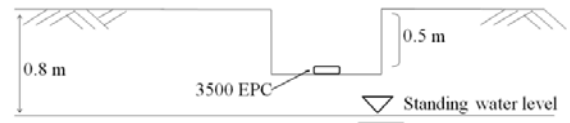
Cross-sectional view of trench and EPC placement (Area 3)
